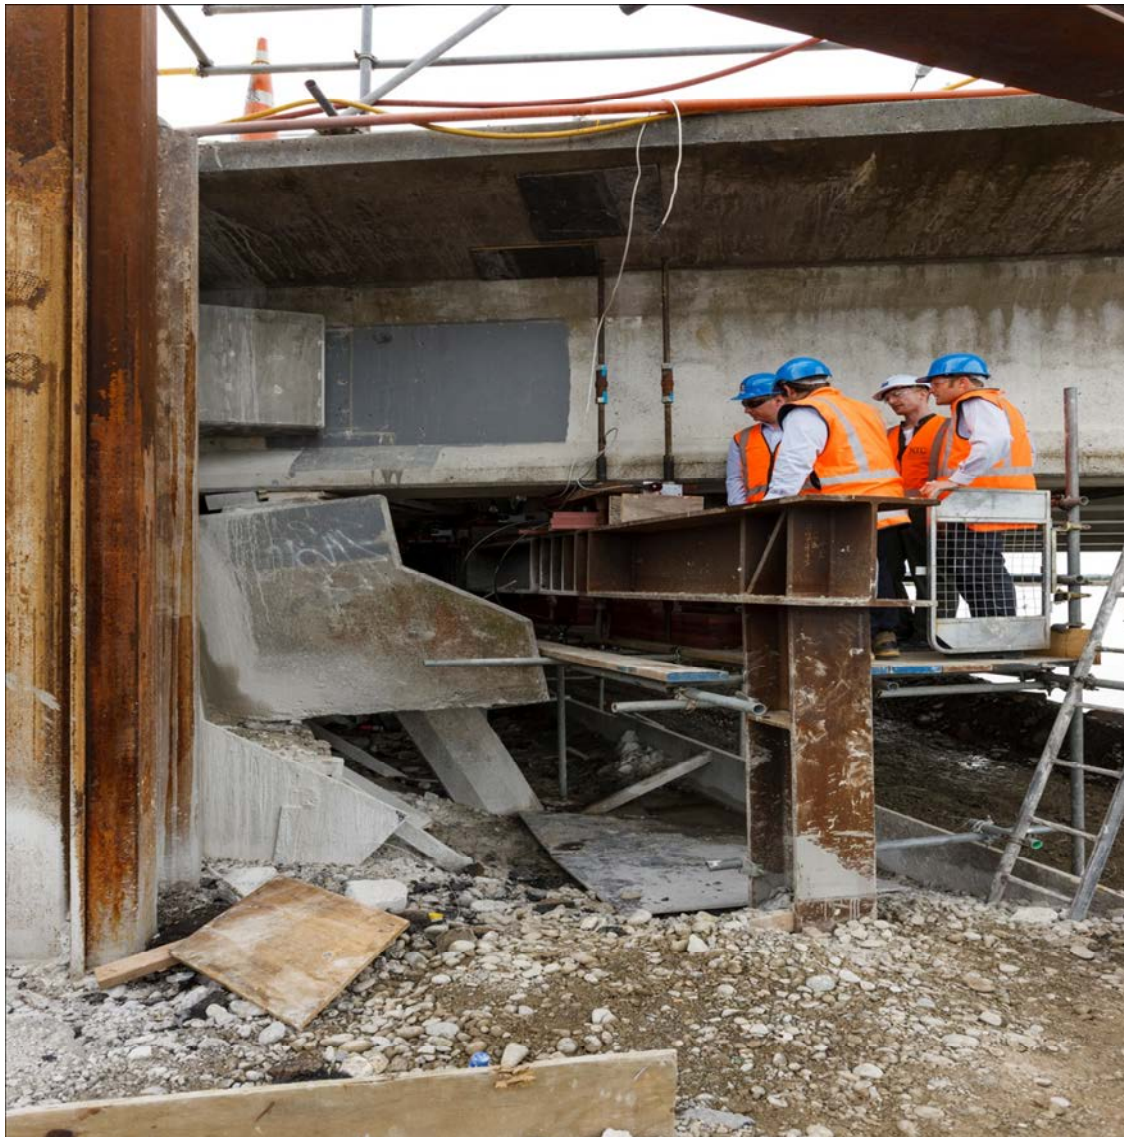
Rolled Abutment and Temporary Abutment prior to lift.
